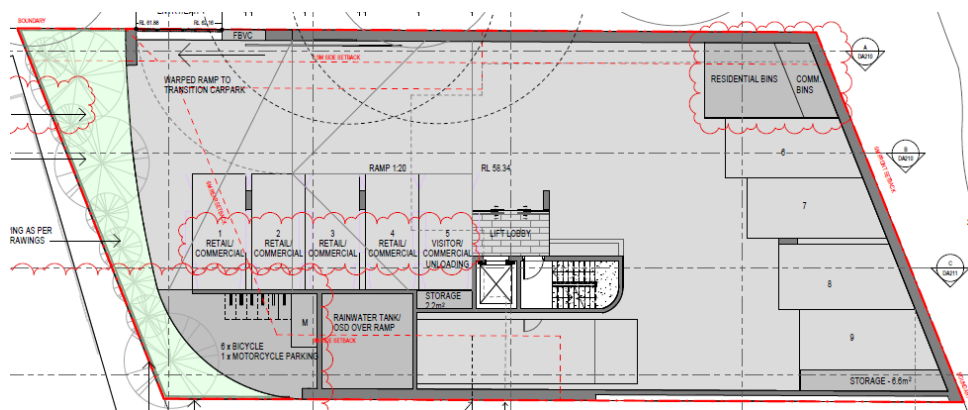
First revision of basement 1 floor plan under the subject DA - 18-20A Perouse Road, Randwick
